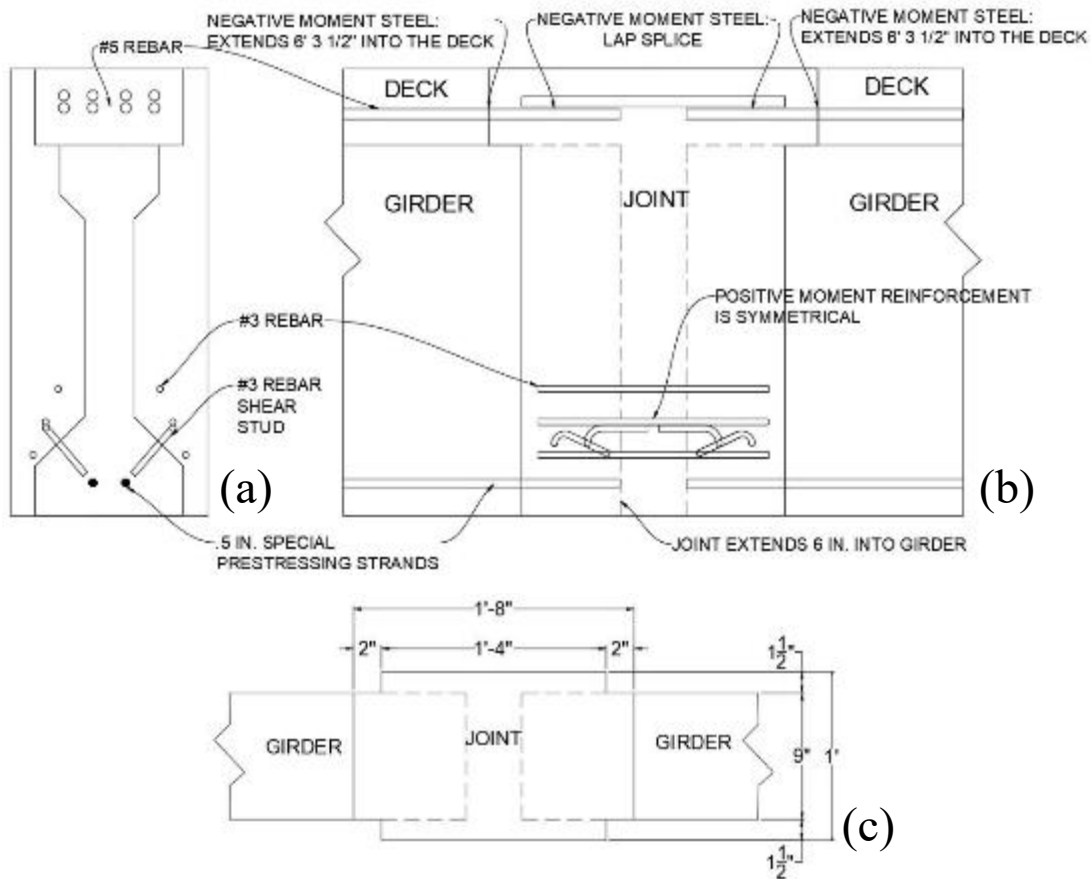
Retrofit continuity joint cross-section (a), elevation view (b), and plan view (c)
